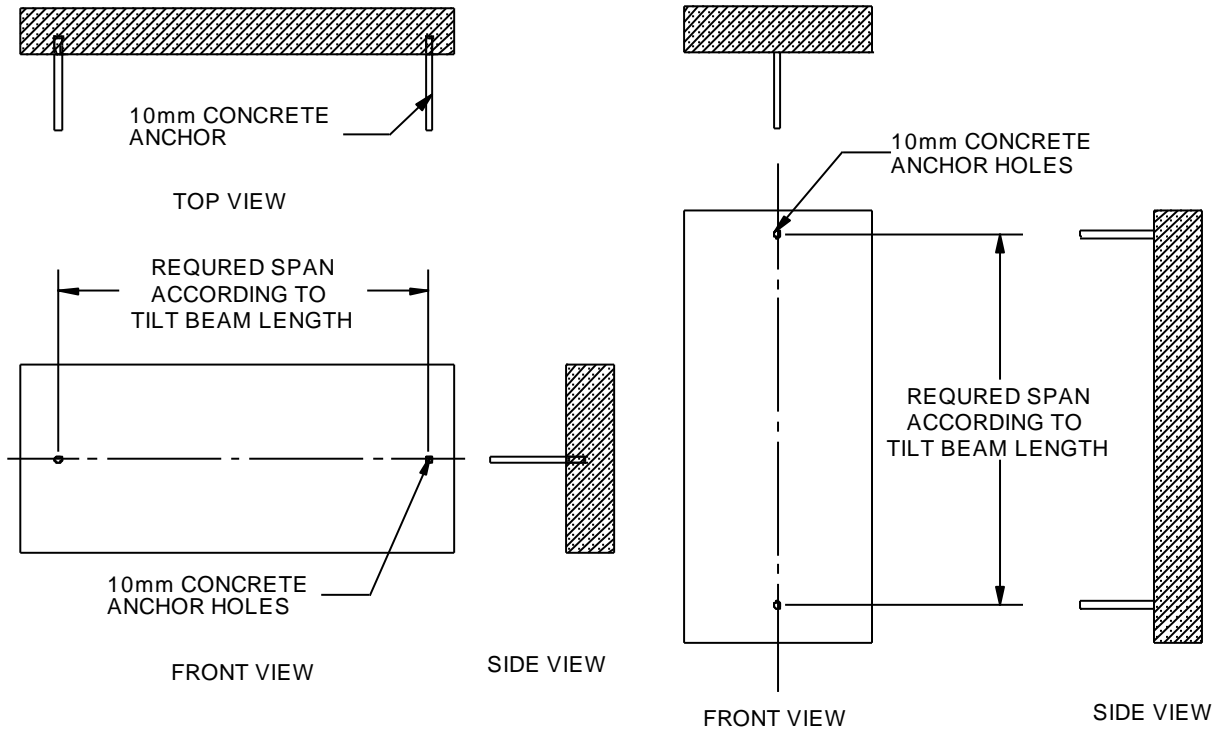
Horizontal & Vertical Tilt Beam Concrete Anchor Orientation
